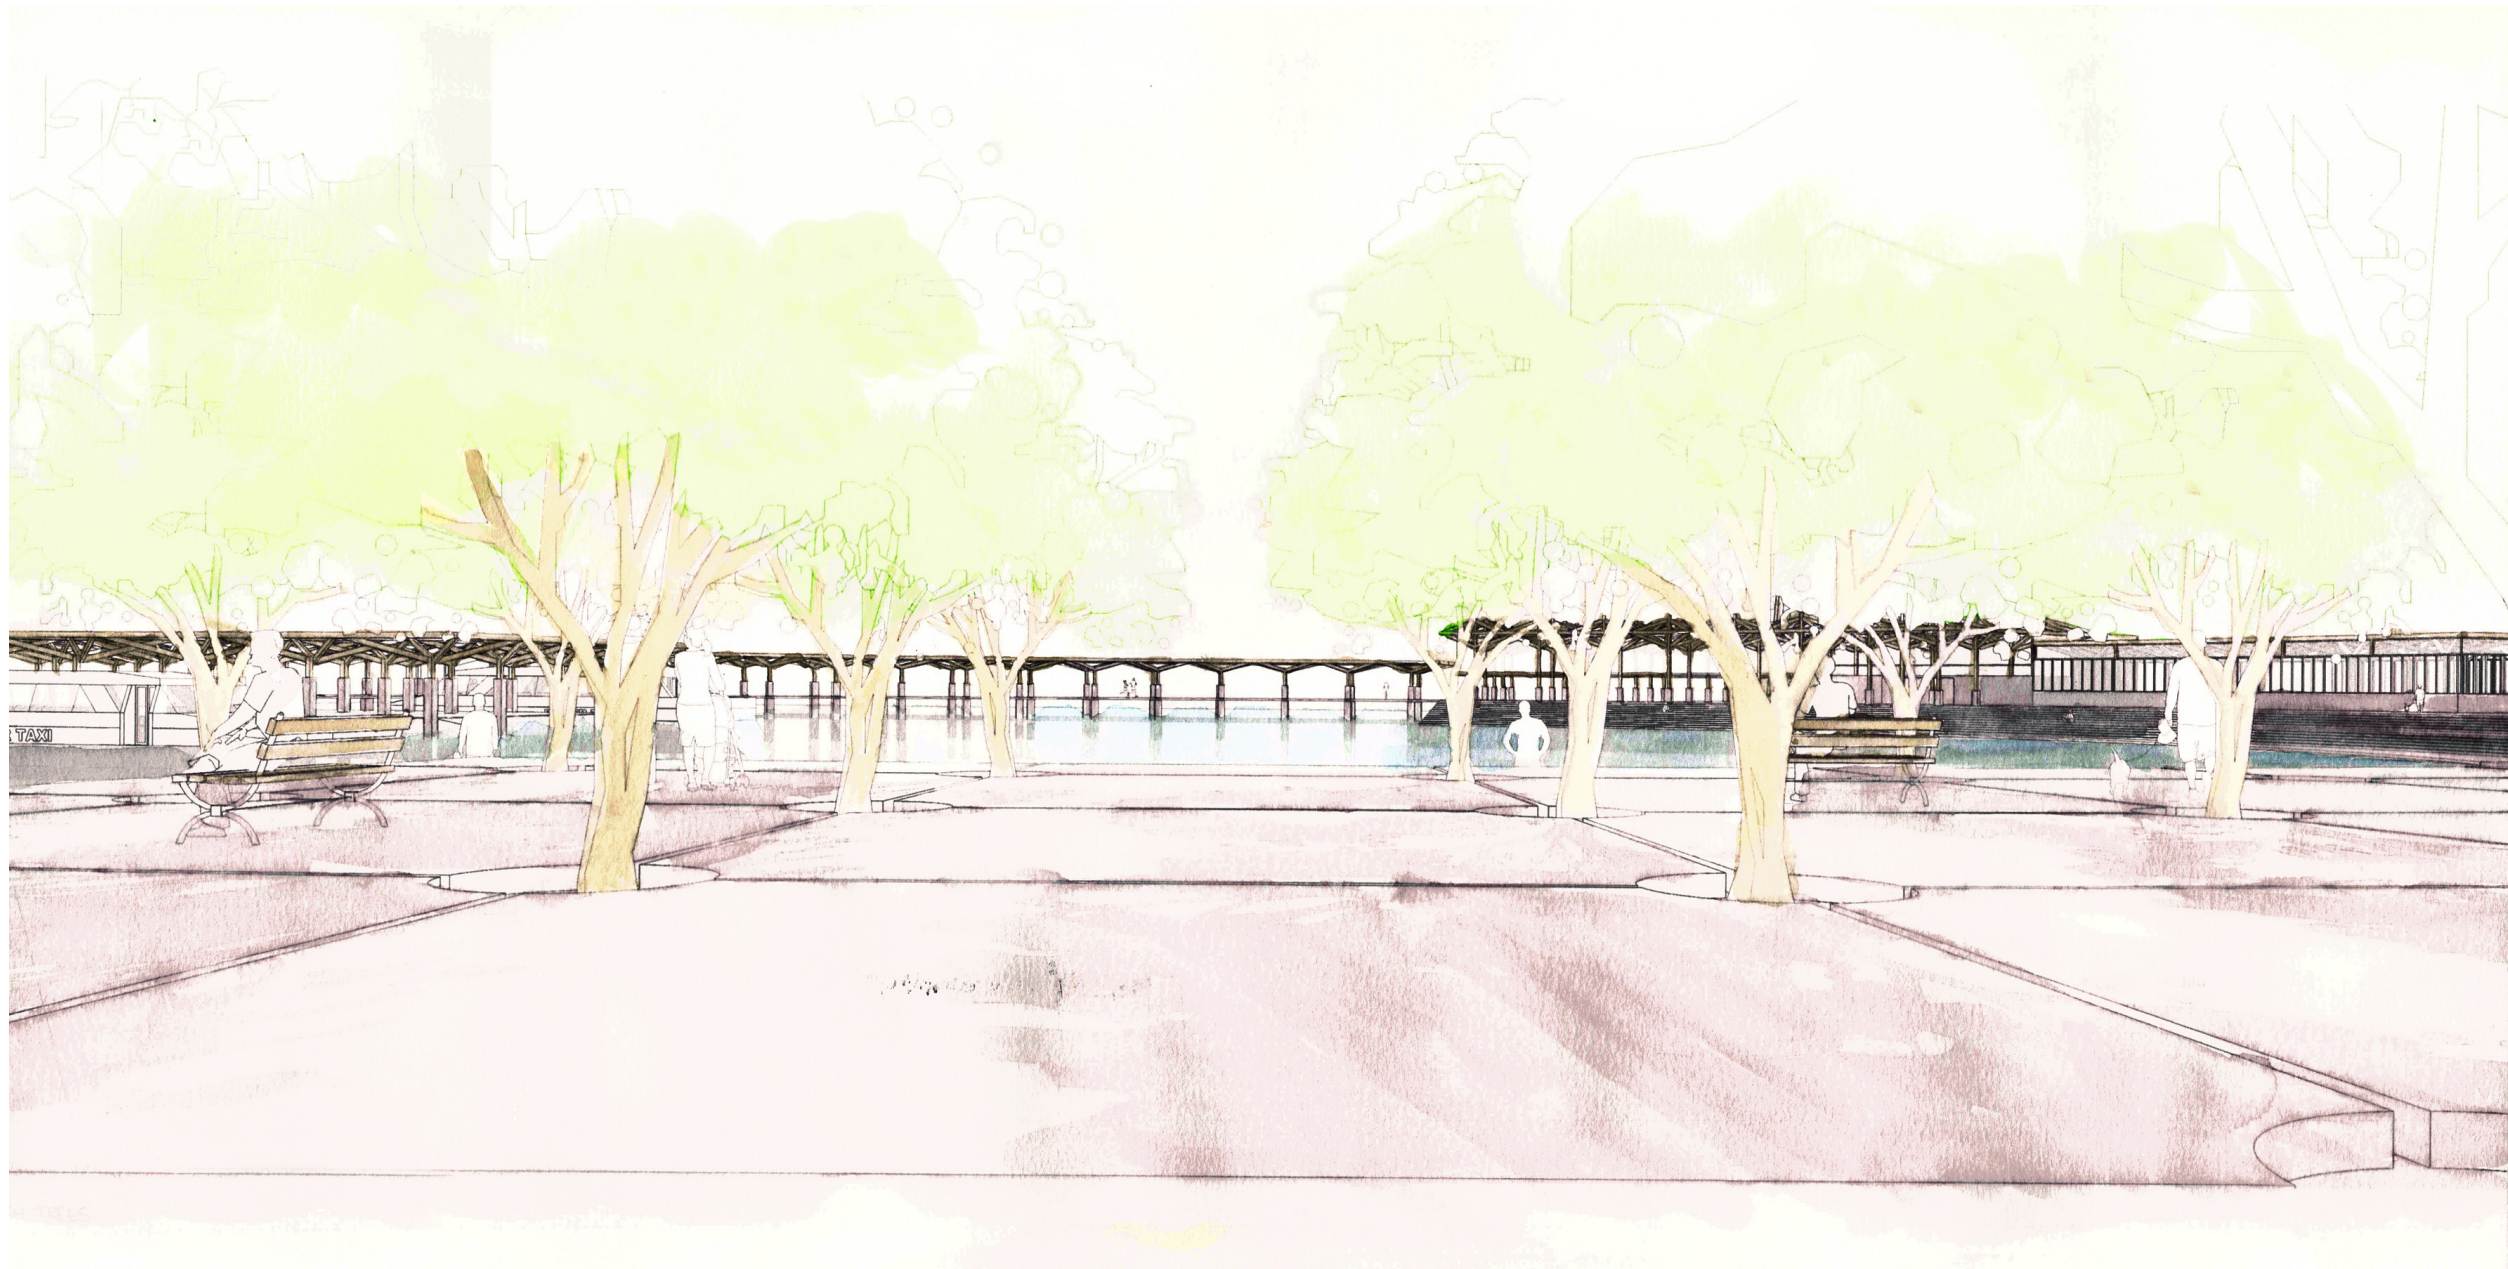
Approach to the river plaza from the allée; arriving between the trees with a view towards the river building and the water pavilion
